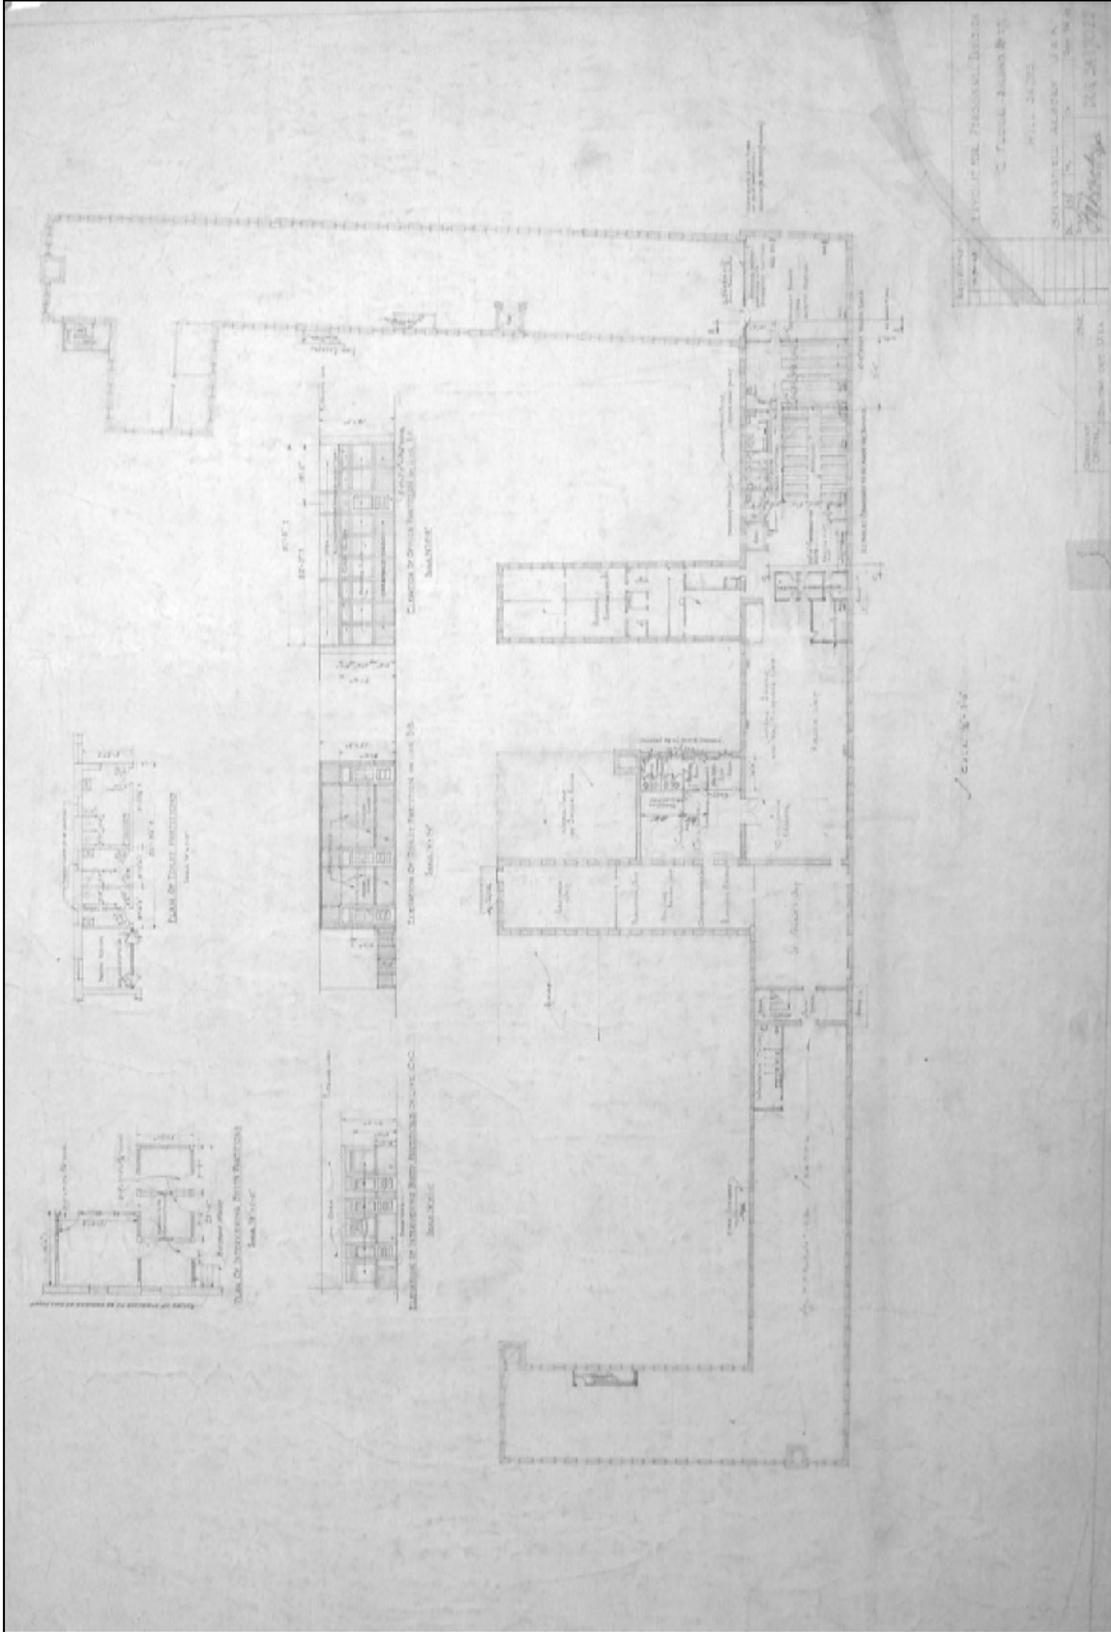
Personnel Division, C (second) Floor, Building No. 27, Hill Shops, Springfield Armory U.S.A., September 24, 1942; not to scale.
